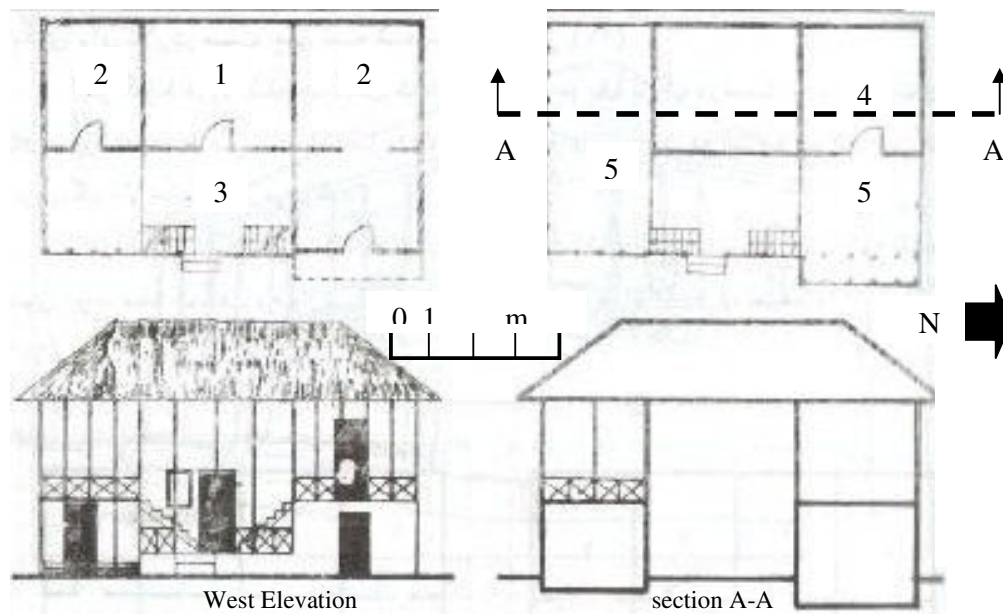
Two floors building with Talar and balcony (1-room, 2-storage, 3-balcony, 4-guset room, 5-talar (Memarian.GH, 2006)
